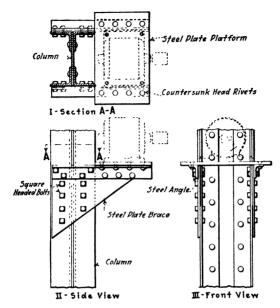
A structural-steel motor bracket attached to a structural-steel column. The same kind of bracket might be attached to a wooden column with lagscrews or to a reinforced-concrete column with expansion bolts.
